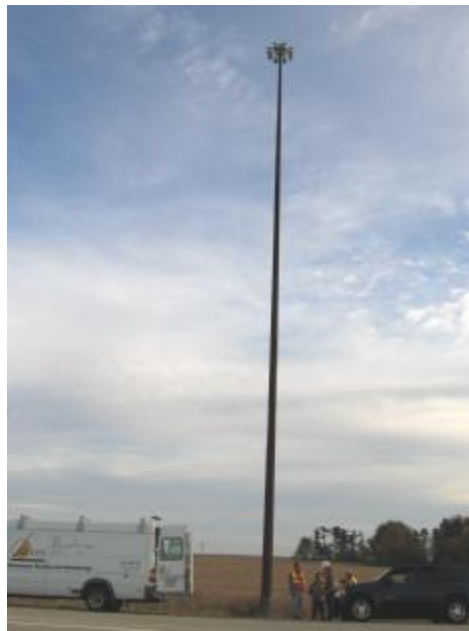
Vertical cantilever used to support light fixtures (high mast tower).
